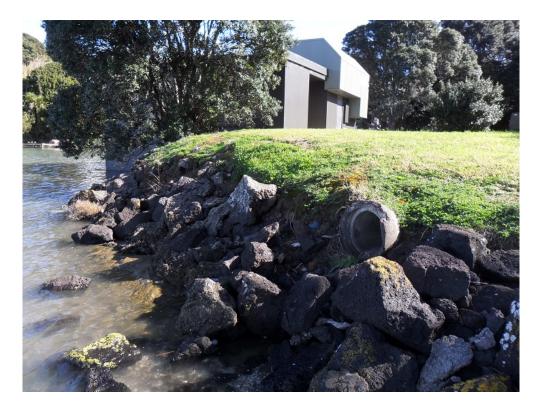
Stratigraphic profile just east of the pump station. Facing north
